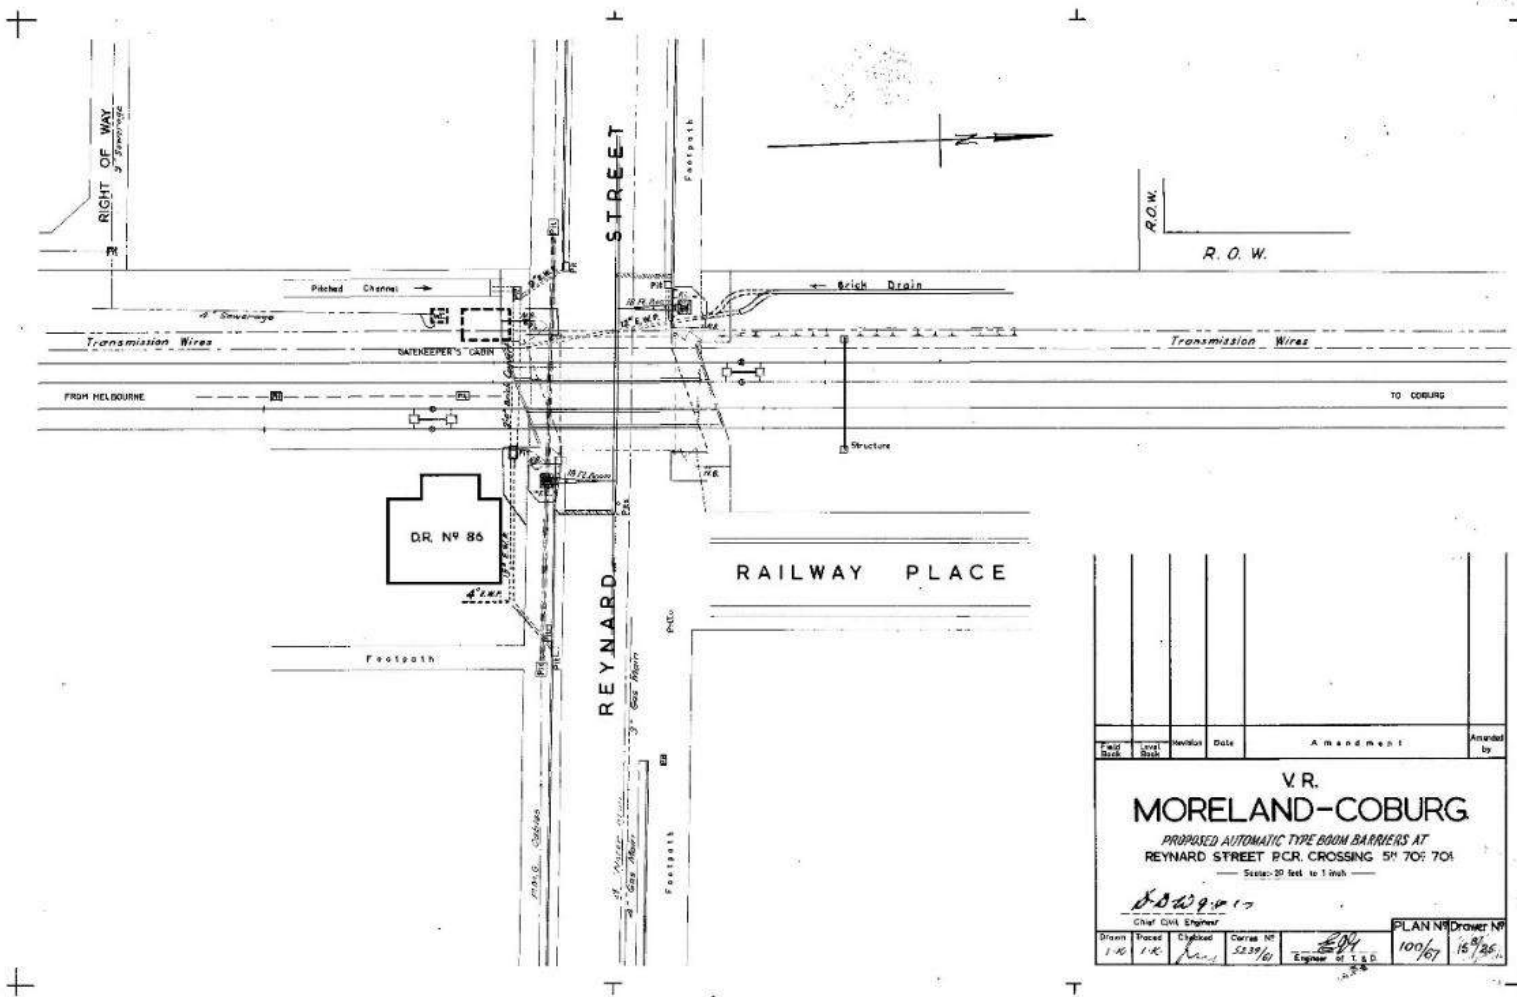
1967 detail plan for proposed automatic boom barriers, showing the gatekeepers house and Gatekeepers cabin at Reynard Street. (Public transport Victoria Drawing Management System. 10/06/2020).
